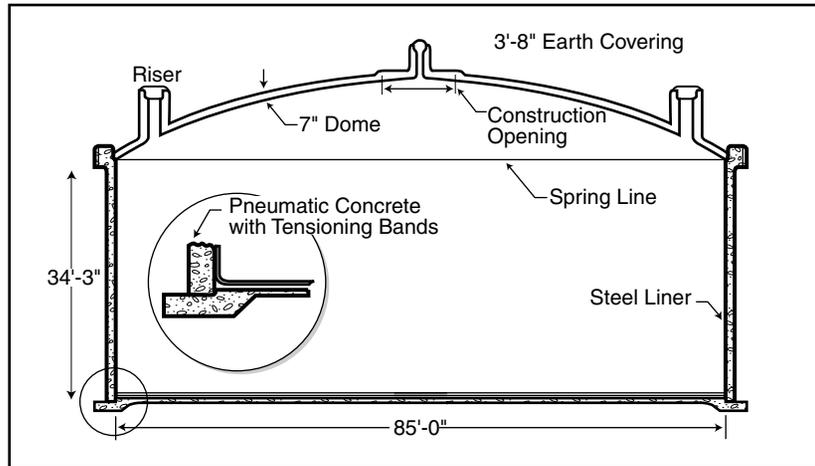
C. Uncooled Waste Storage Tank, Type IV (Prestressed concrete walls, 1,300,000 gallons)
